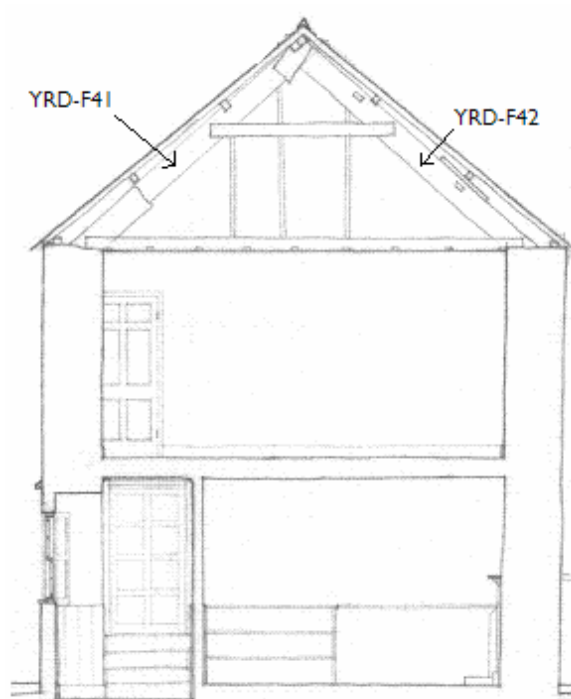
North-facing section through the North-South range, showing truss 6 and the location of samples YRD-F41 and YRD-F42 (Architecton, section position shown on Fig 16)
